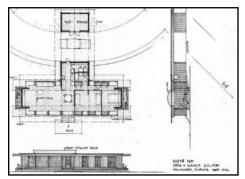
Floor plan of Hulmes House (built 1956) illustrating diagonal orientation of house to its site [Charles Reed, Jr. collection]
